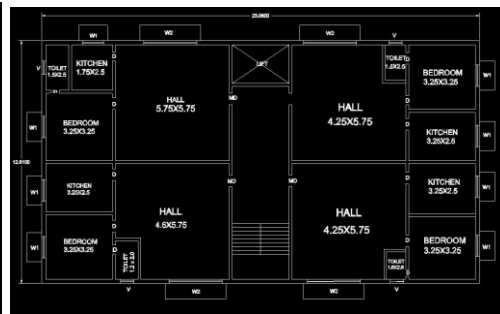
Floor plan (1st to 7th, 9th, 10th Floor)
